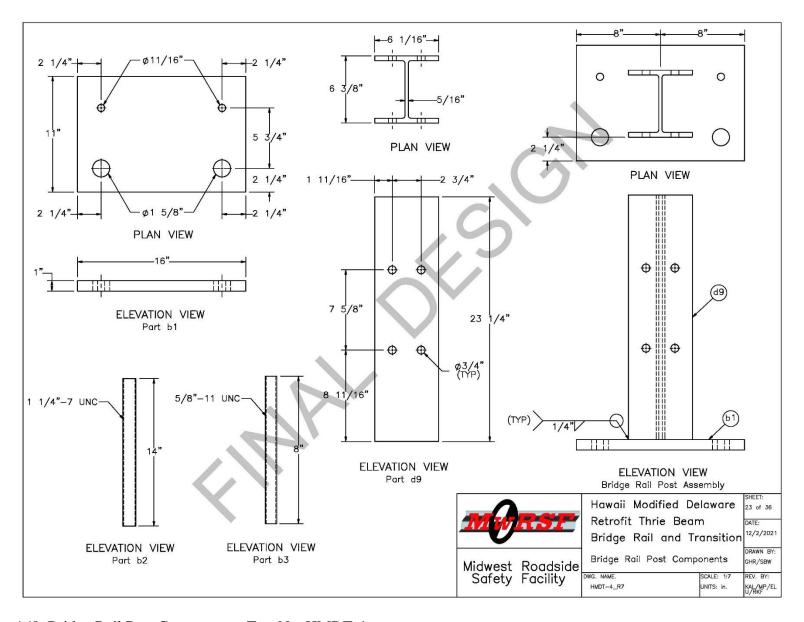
Bridge Rail Post Components, Test No. HMDT-4
